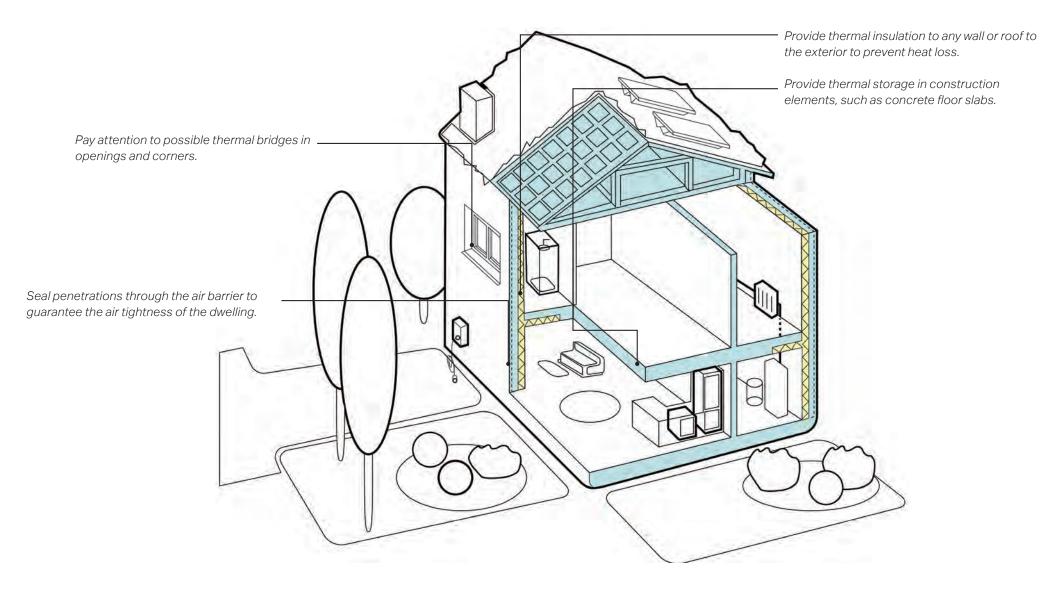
Diagram of a dwelling demonstrating the building fabric.
